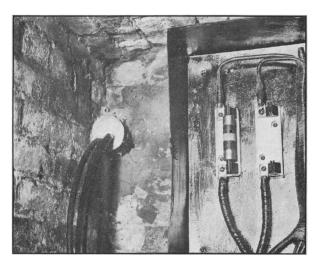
PROPERLY SEALED CONDUIT CARRYING ELECTRIC WIRES AND ENTERING THROUGH BASEMENT WALL. OPENINGS AROUND AND WITHIN CONDUIT SEALED WITH FINE CEMENT THE FULL DEPTH OF THE WALL.
